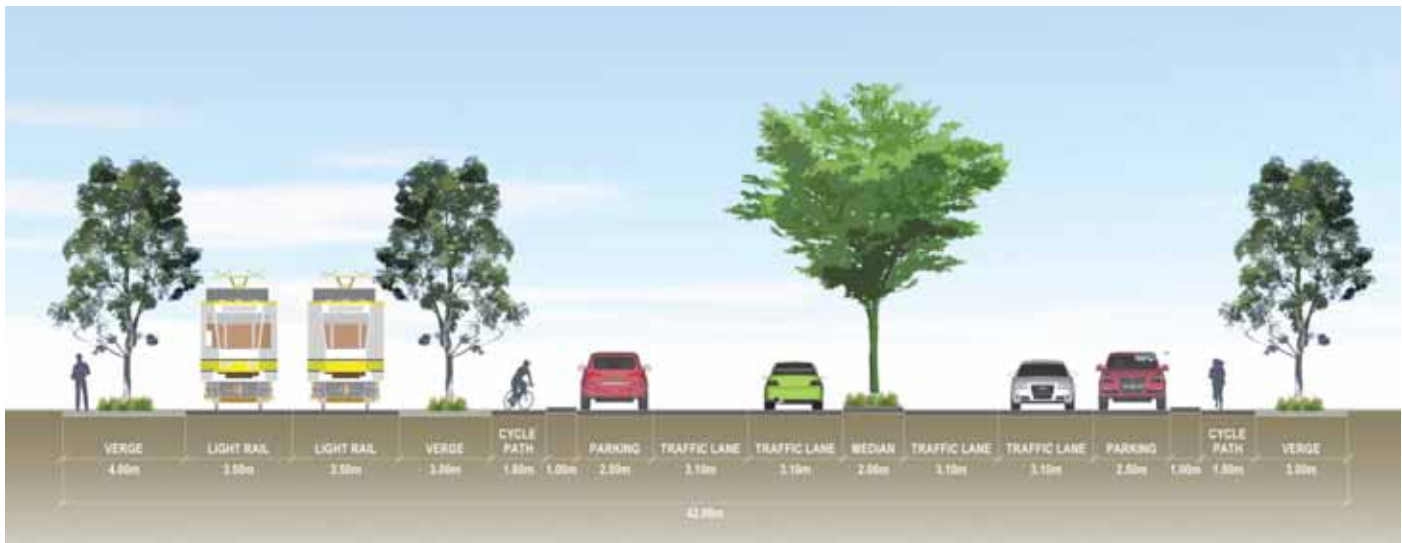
Stephenson Avenue Conceptual Cross Section – Stephenson Bridge
